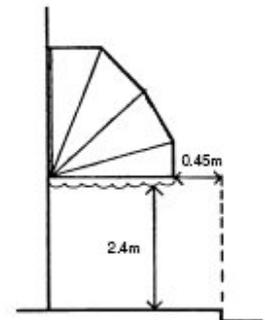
Dutch-style retractable “fan” blinds are not suitable, as they hide architectural details and interrupt building elevations.
